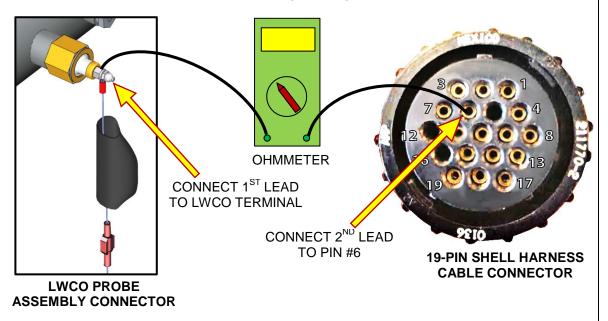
Connecting Ohmmeter between LWCO Probe & Shell Harness Cable
